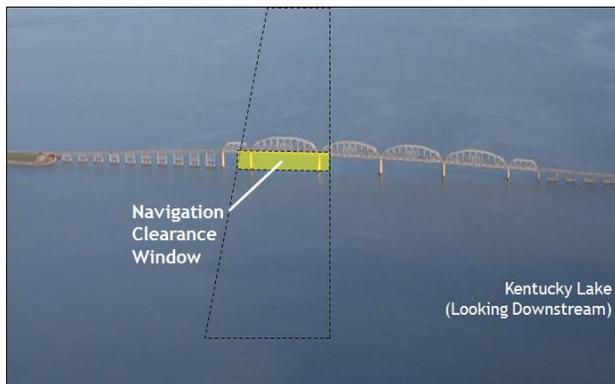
Egner’s Ferry Bridge with Navigation Window of the New Kentucky Lake Bridge Shown
